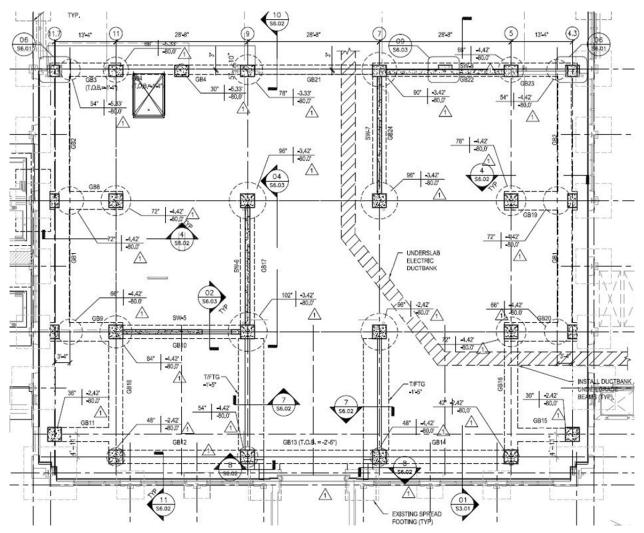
New Addition Foundation Plan - Courtesy of the Whiting-Turner/Walsh Joint Venture
